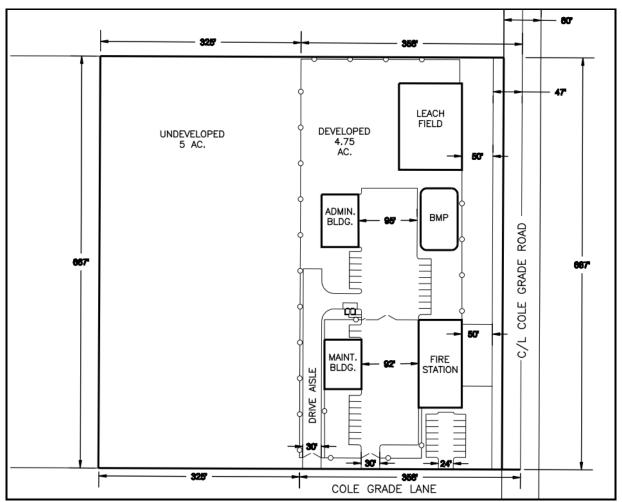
Preliminary Site Plan (source: Buccola 2020)
